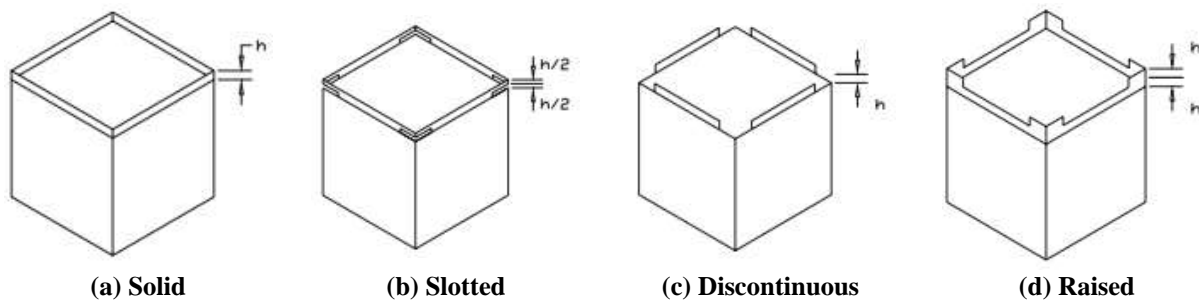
Parapet configurations for altering wind flow over roofs (Kopp et al. 2005)
